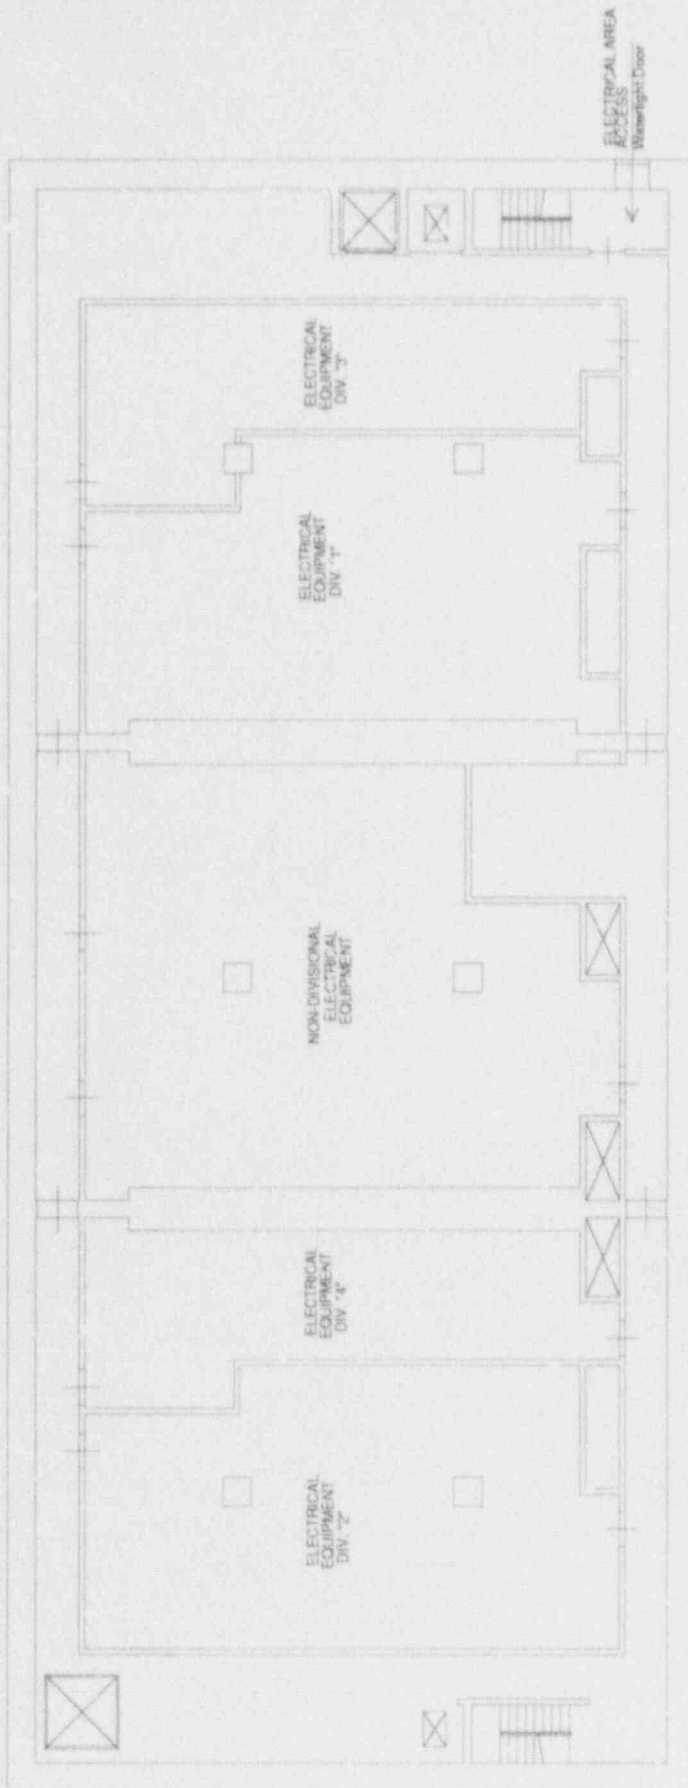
CONTROL BUILDING FLOOR B3F
